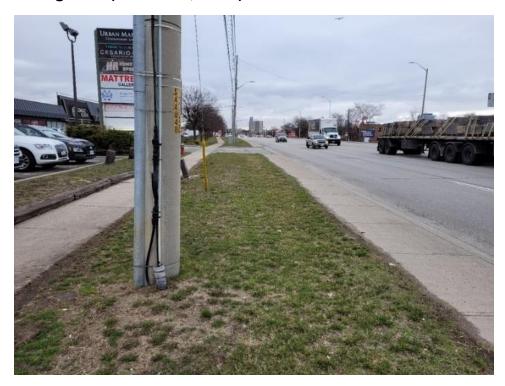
Typical commercial development adjacent to ROW, facing east (March 31, 2021)
